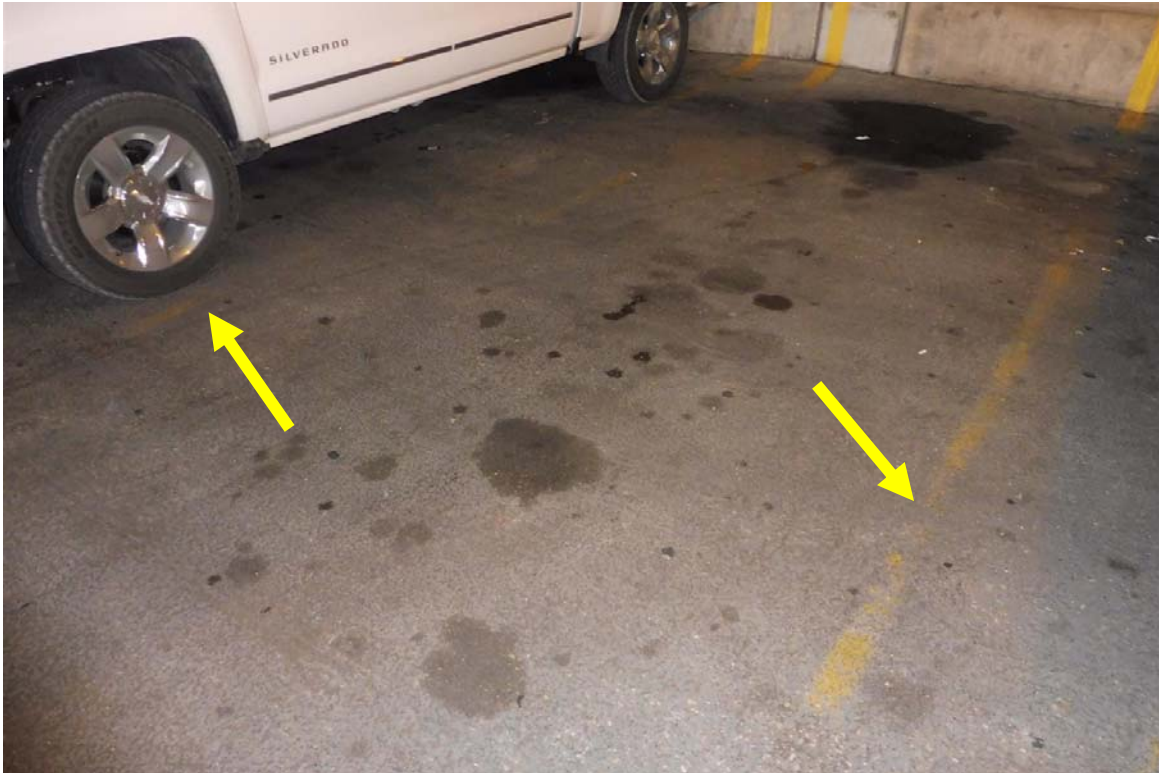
The striping paint throughout the garage should be reinstalled as many of the parking stall lines have faded/worn away.
